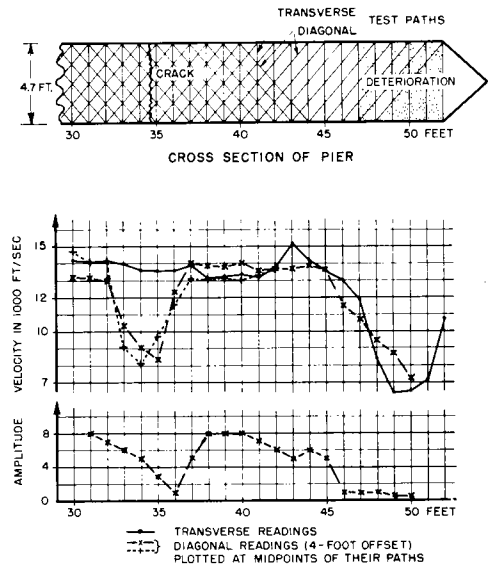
Typical data from a bridge pier showing a transverse crack and transverse deterioration.
